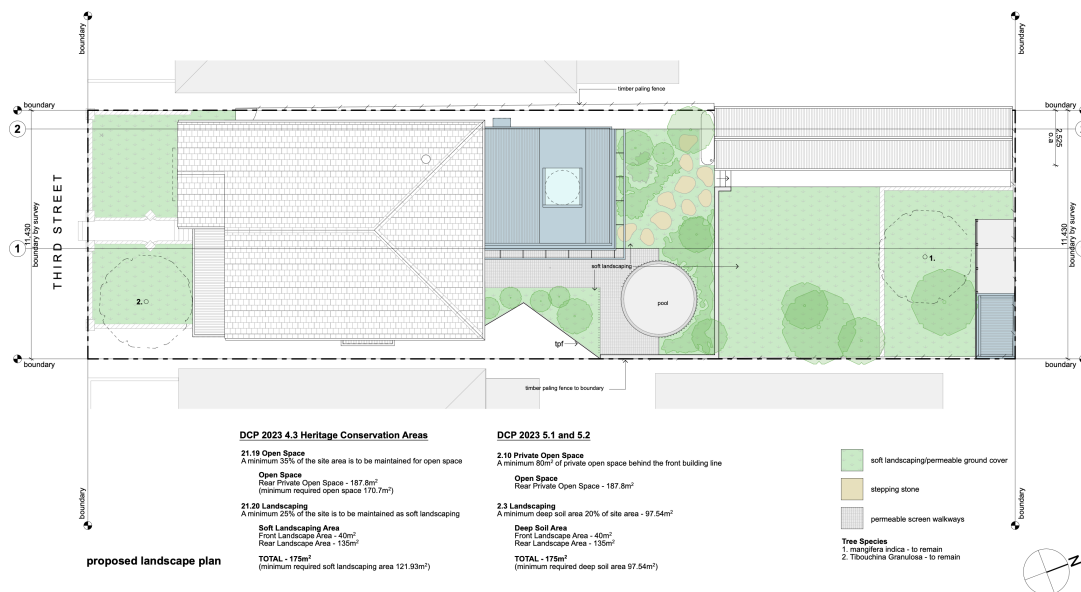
Proposed Landscape Plan: deep soil and private open space areas exceed DCP minimums; two established trees retained
